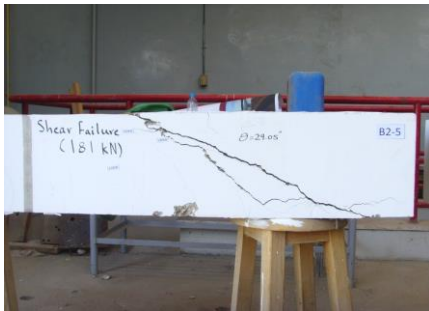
'B2-5 Shear Failure at the Load of 181 kN
